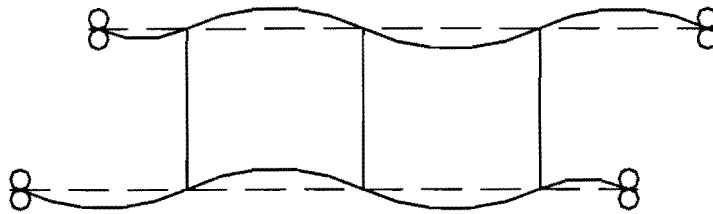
Coupling Details between Braces and Girders of FEA Model
